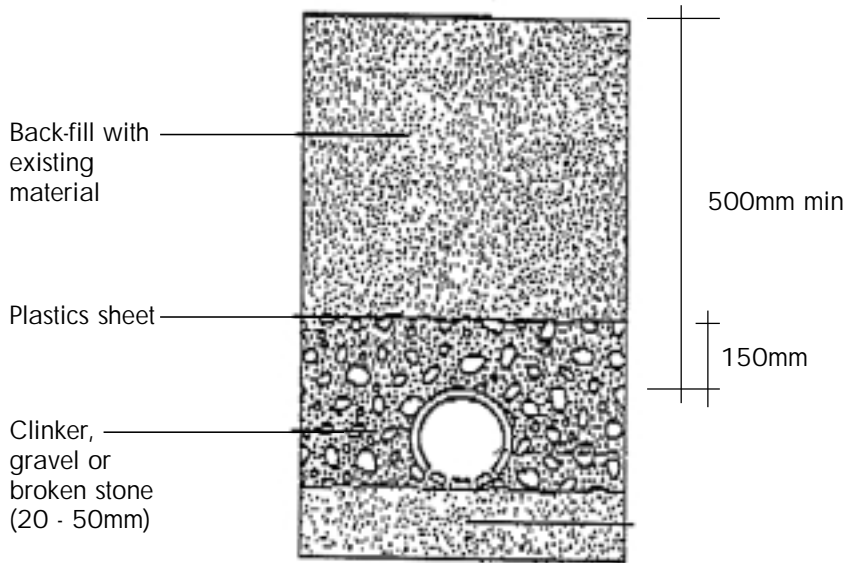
A LAND DRAINAGE PIPES FOR DISPOSAL OF SEPTIC TANK EFFLUENT
